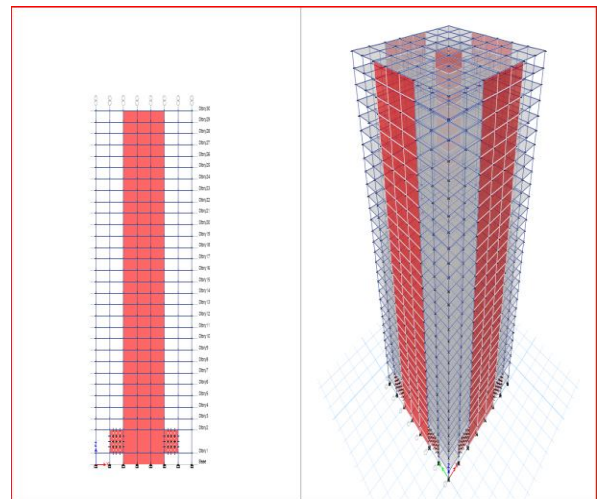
Elevation and 3-d view of Soft Story model with Flag shear wall
